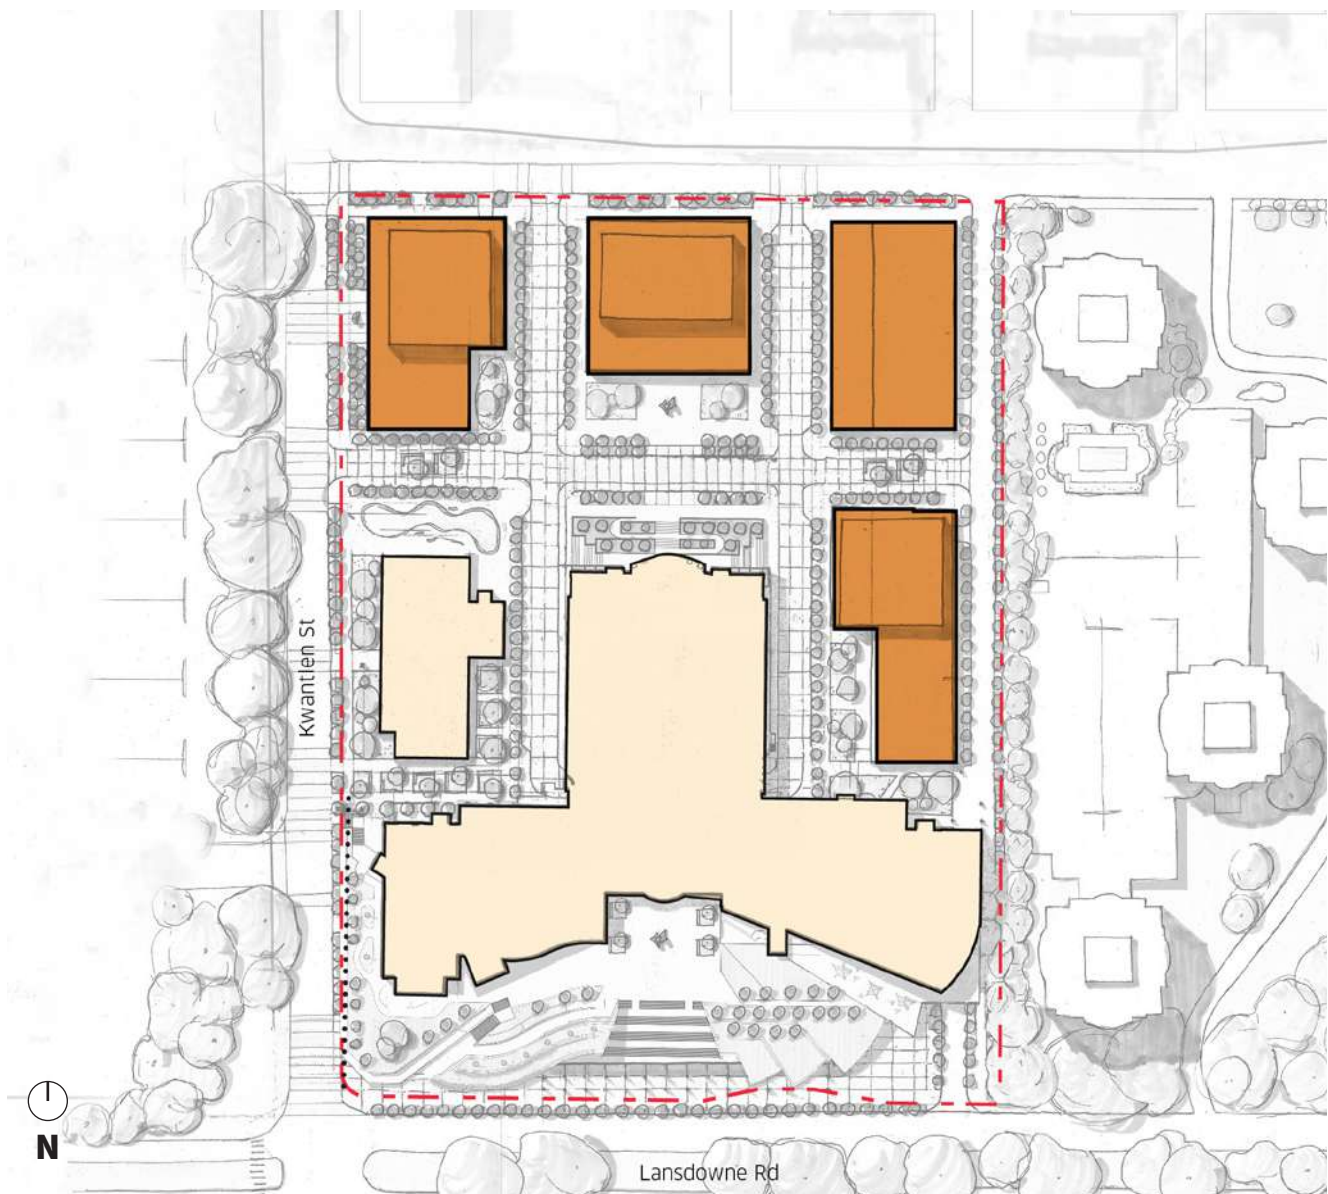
Richmond Campus Existing Buildings, Proposed Buildings
